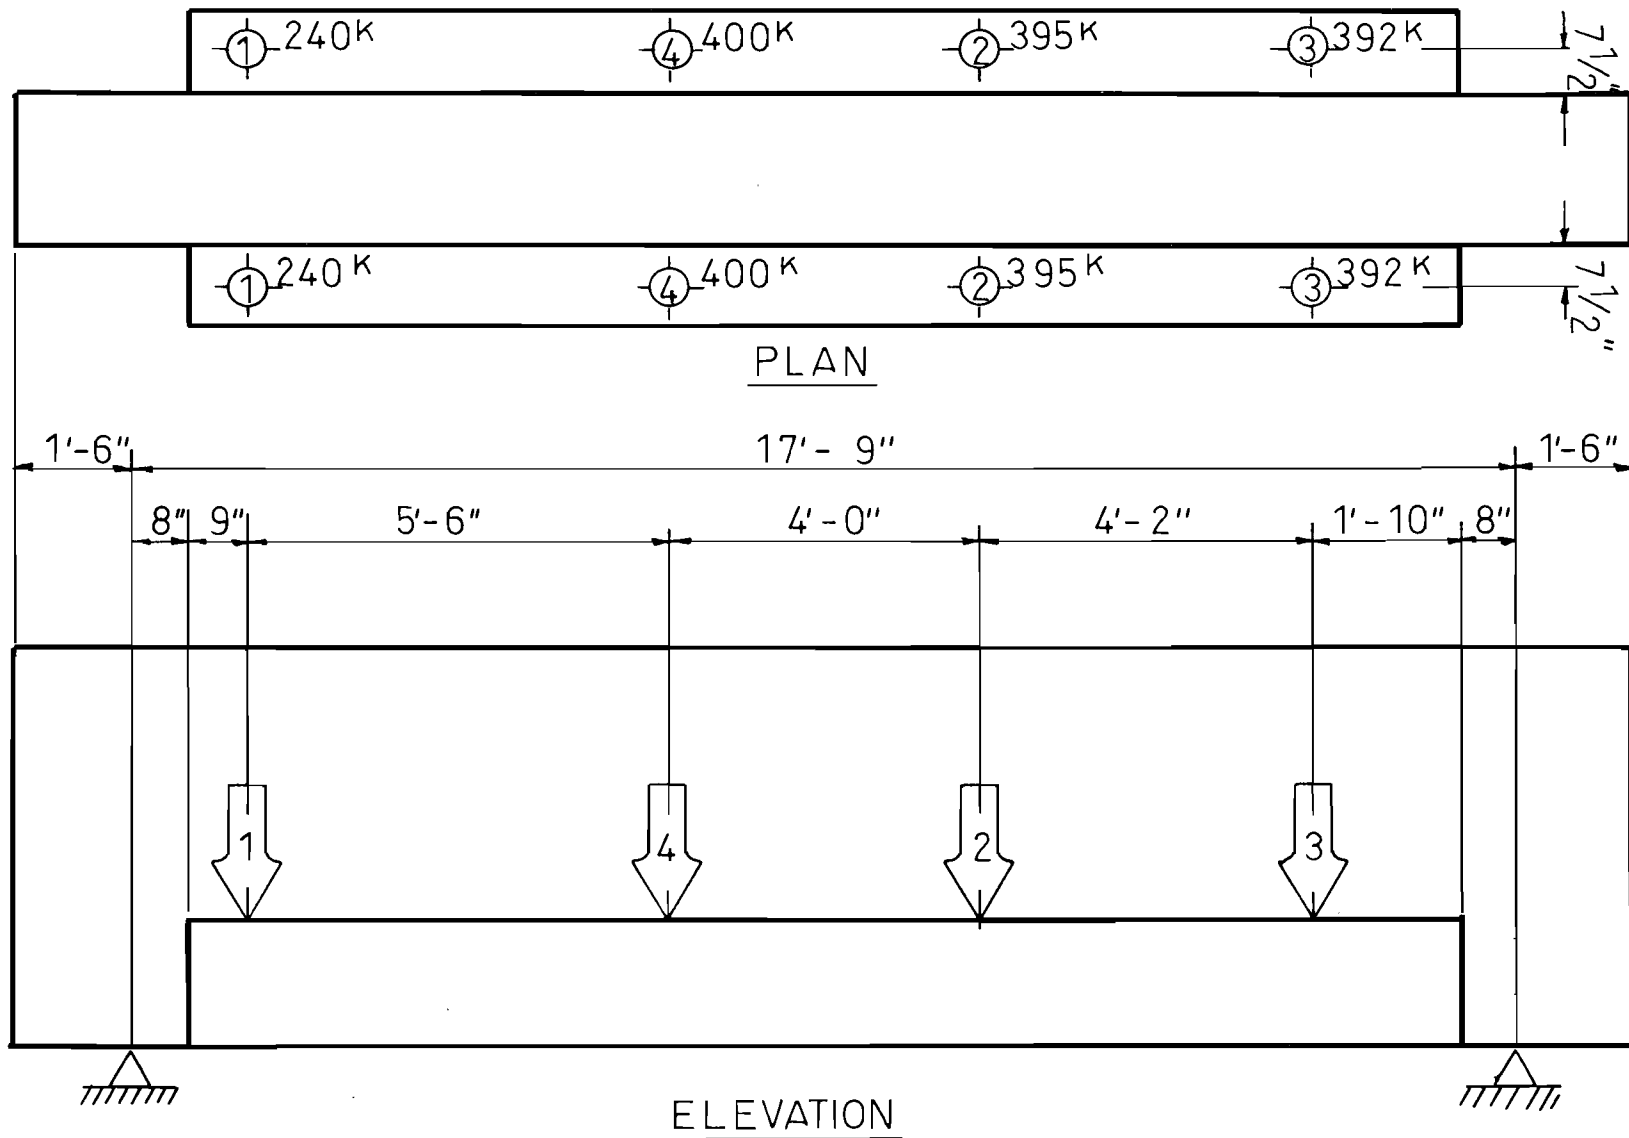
DETAILS OF FULL-SCALE BEAM 2.
